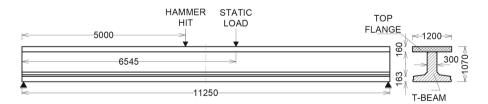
Beam geometry, lateral view and cross section. Dimensions in mm
